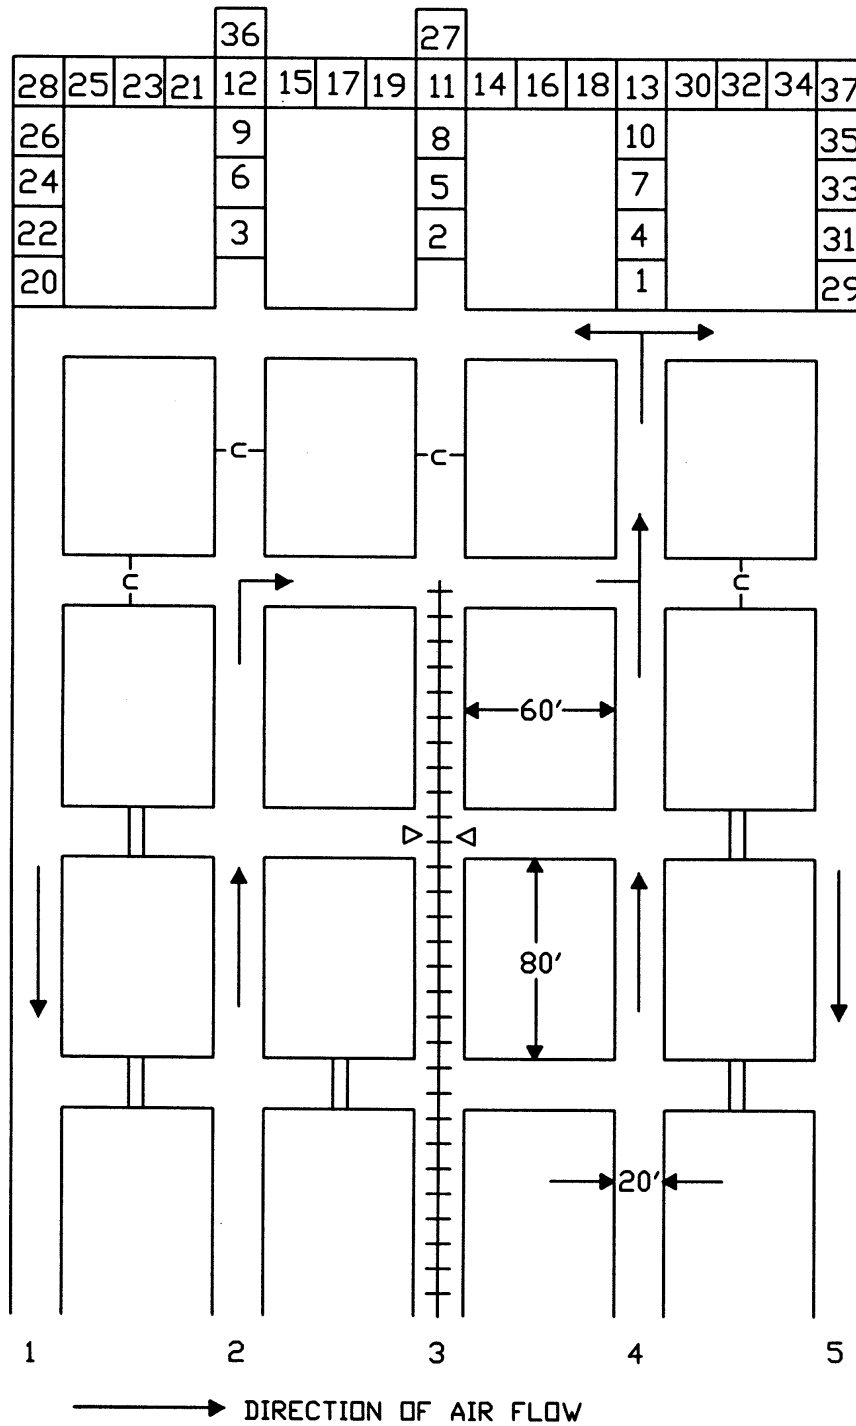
Room and Pillar Layout (Stefanko,R. 1983)
